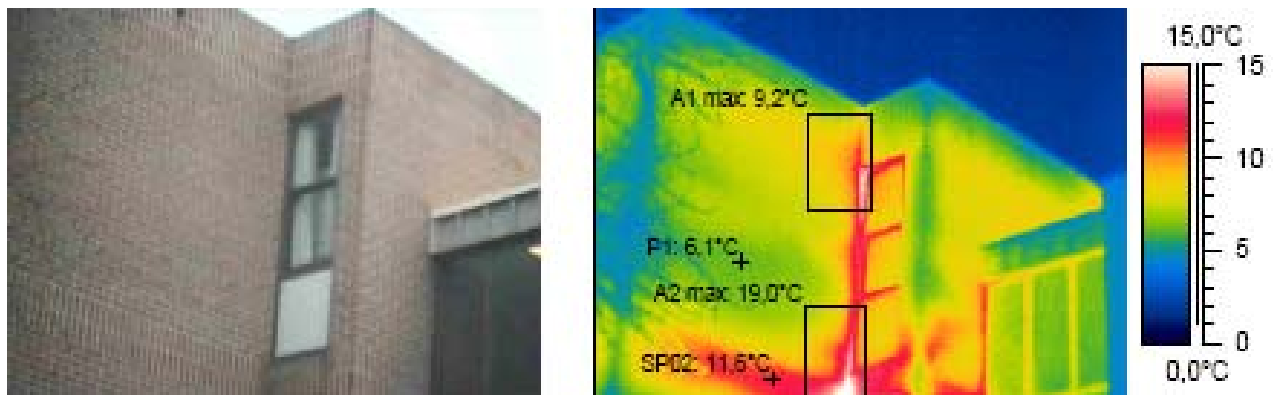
Outside view of the barrack building external wall. Air leakage through windows and cracks in the wall identified by fan-pressurization test.
